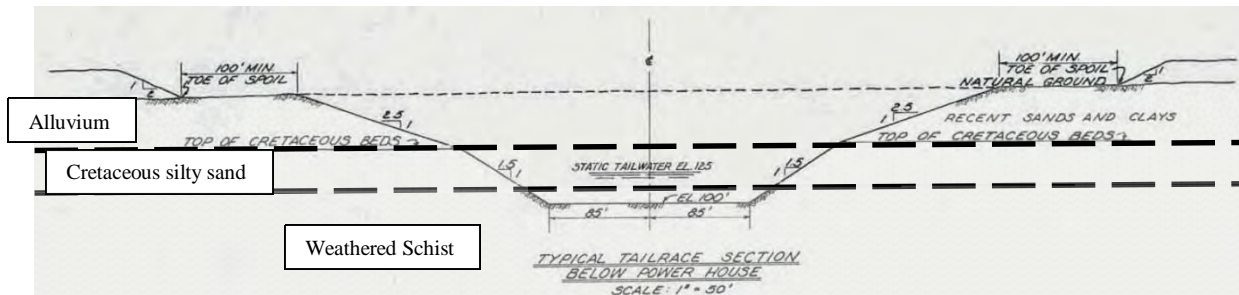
Geology and construction of tailrace canal, just below the powerhouse (FERC 1978).
